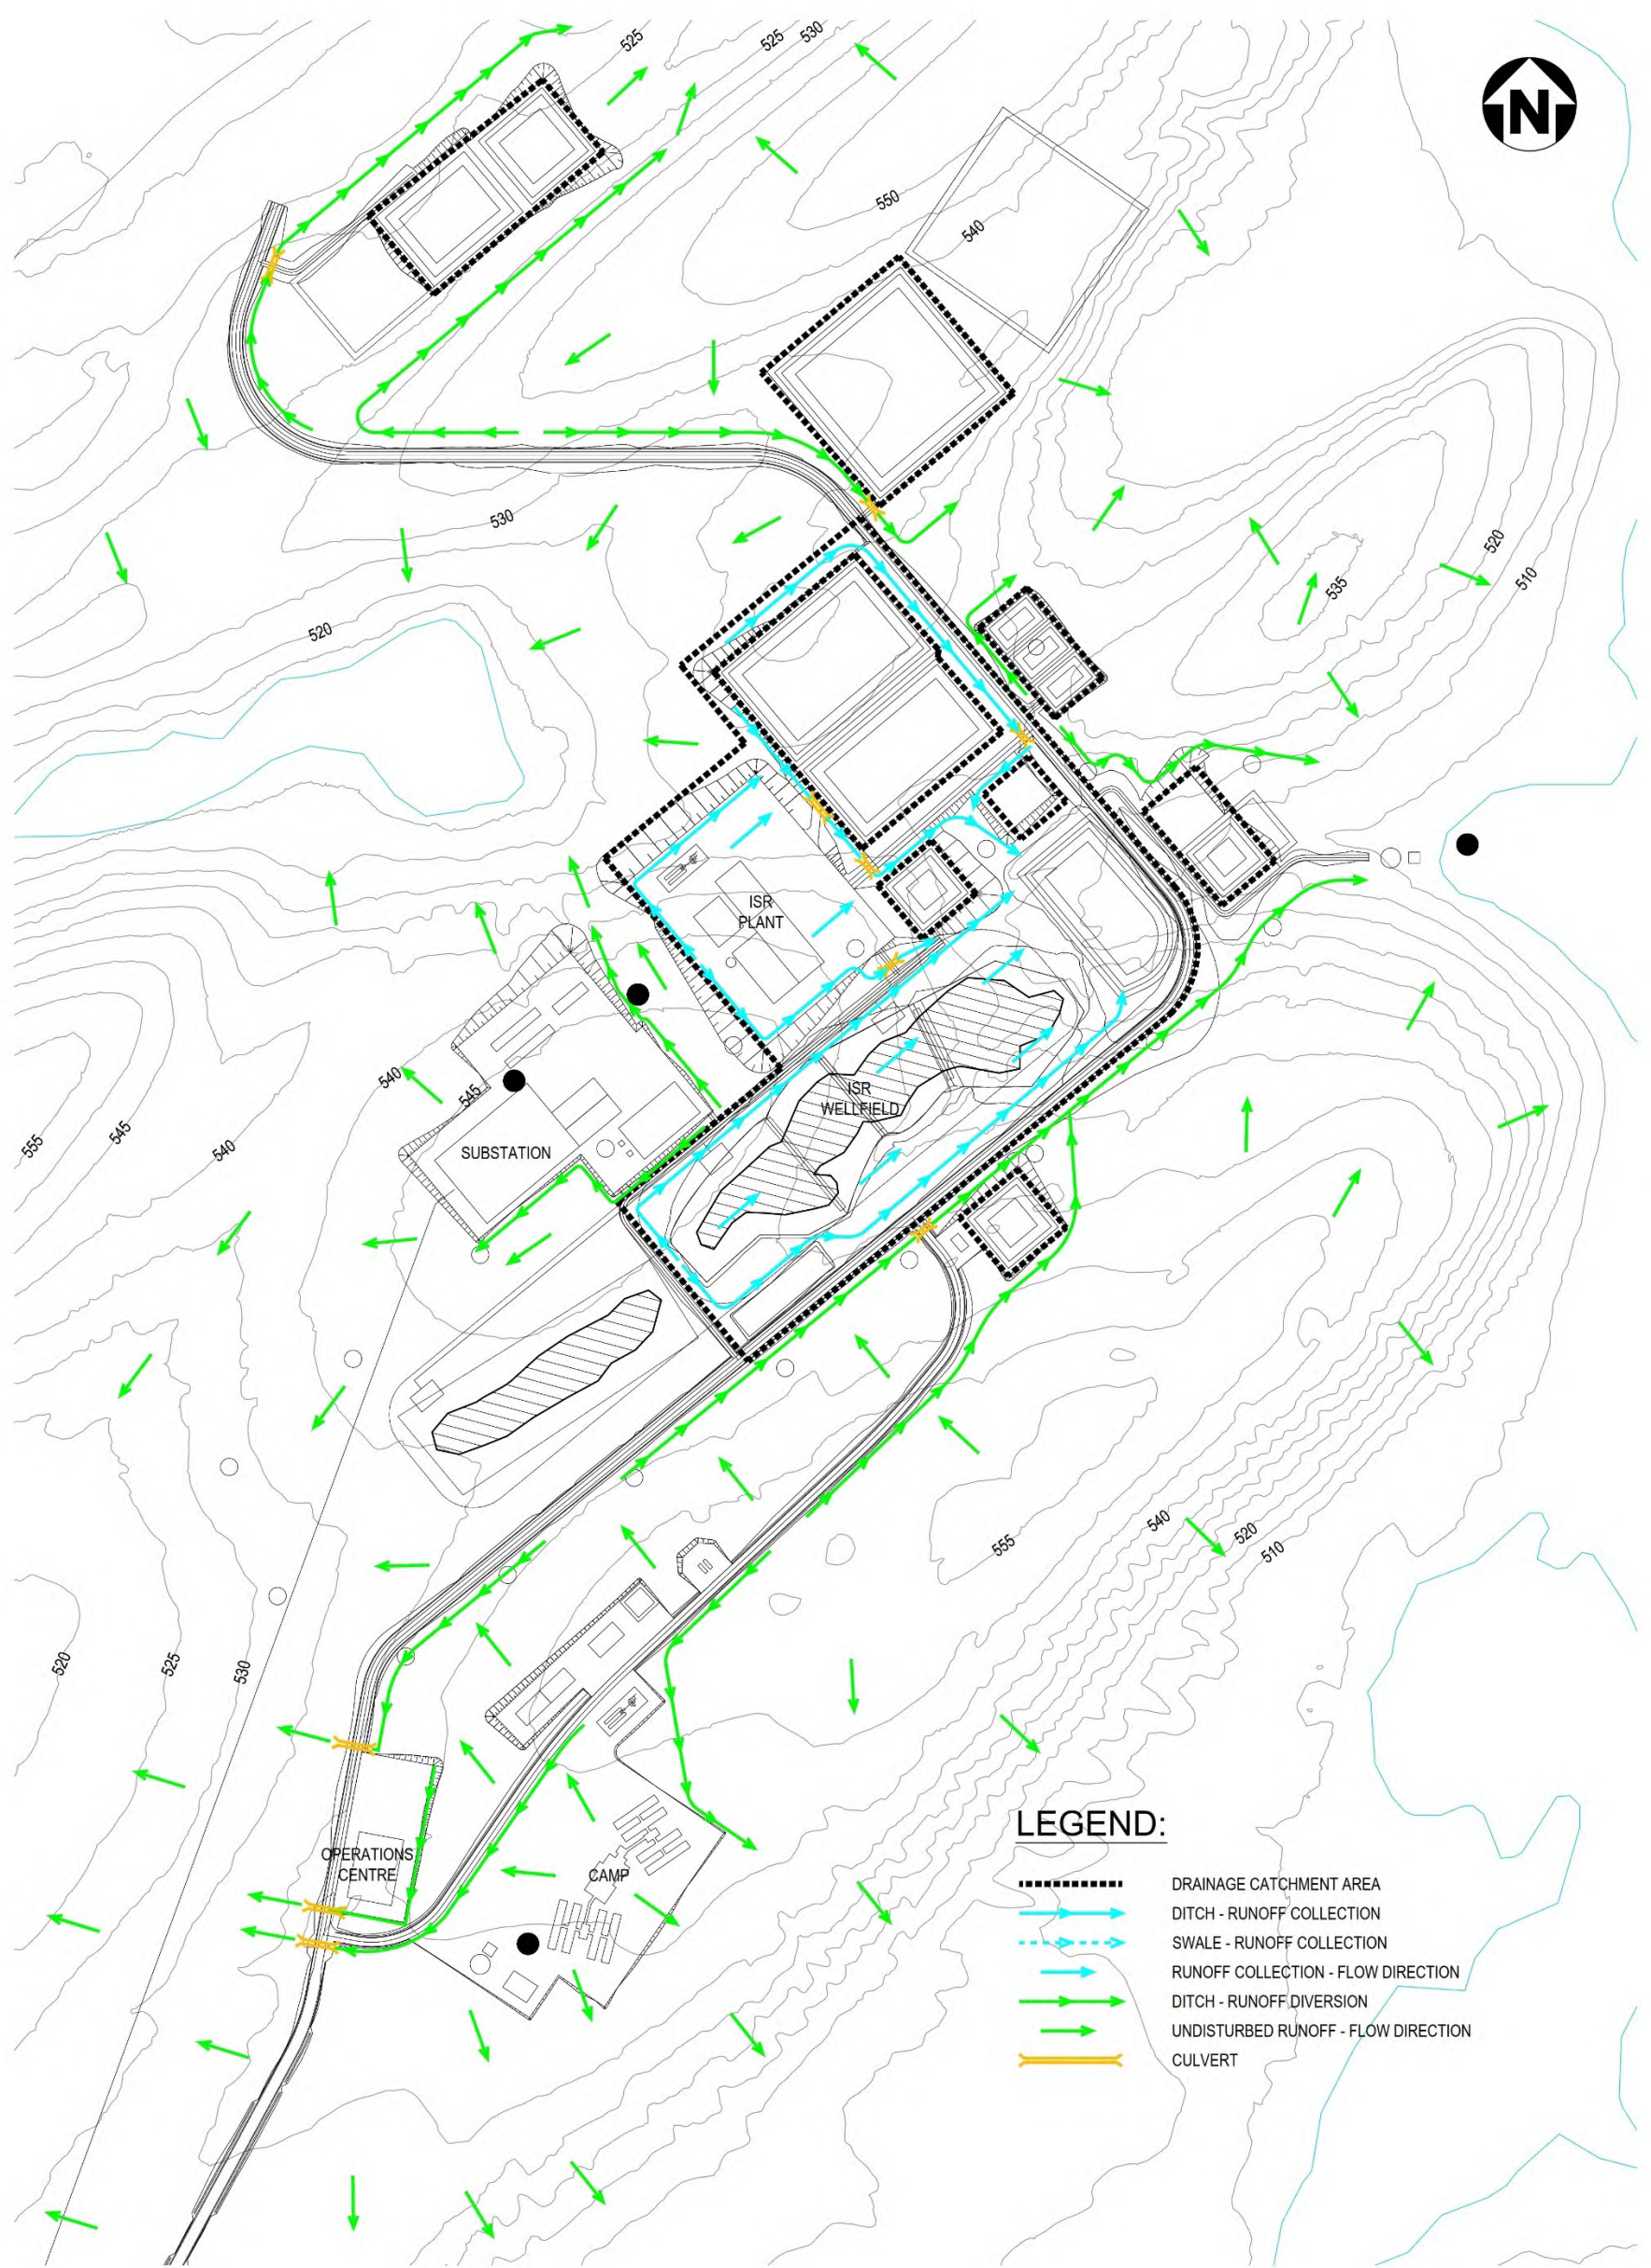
Site Drainage Plan with Flow Direction and Culvert Locations
